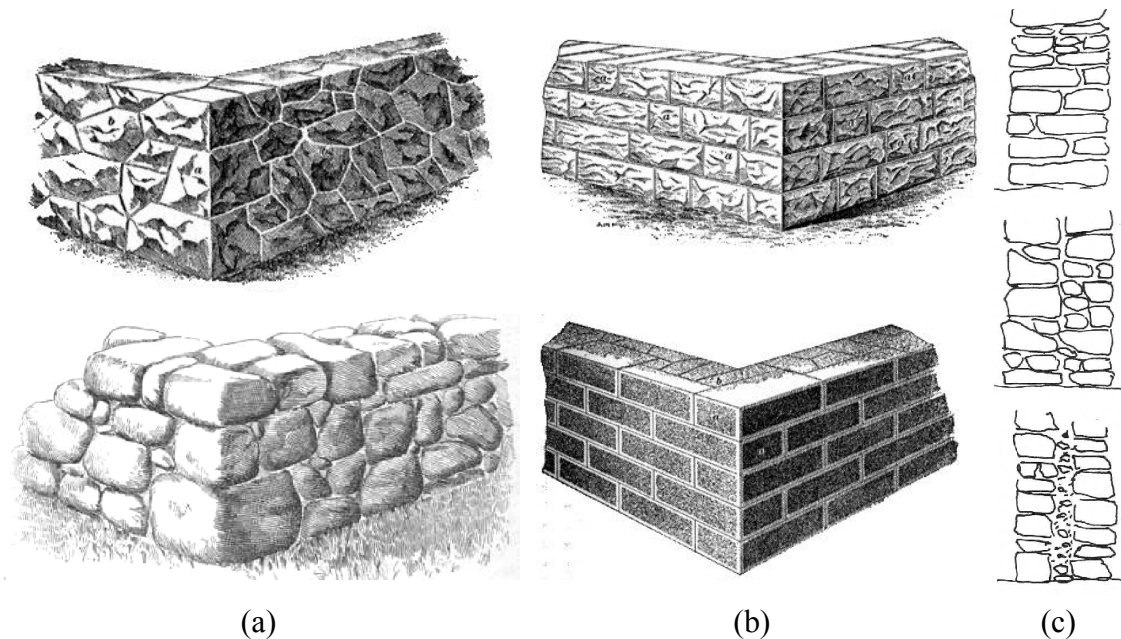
Examples of masonry: (a) rubble walls (b) ashlar walls (International Correspondence Schools 2008); (c) single, double and three leaf walls (Mascarenhas 2003).
